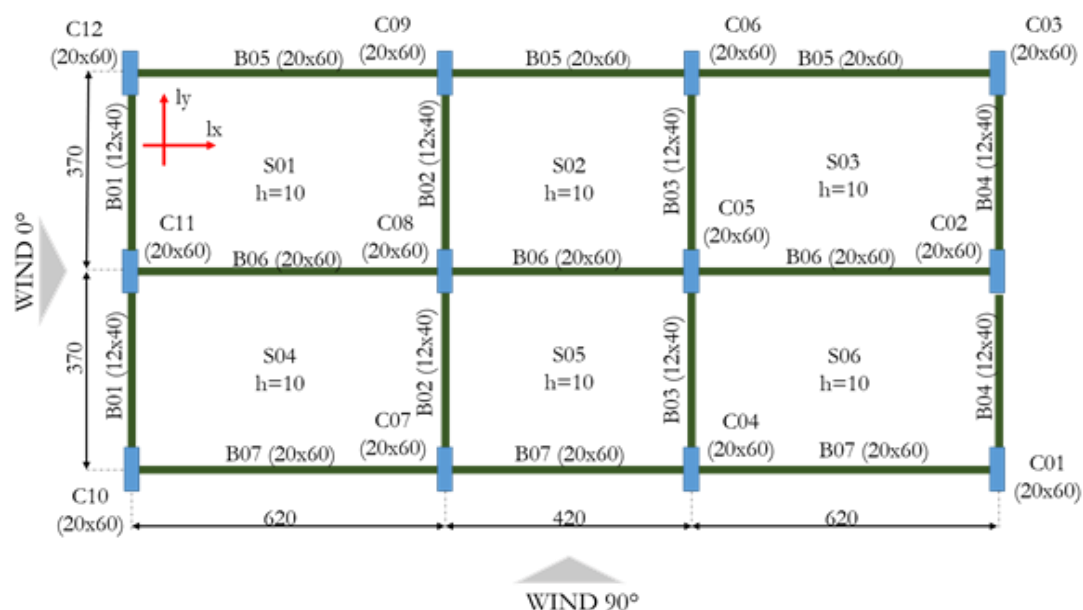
Floor plan for the structural building (dimensions in centimeters)
